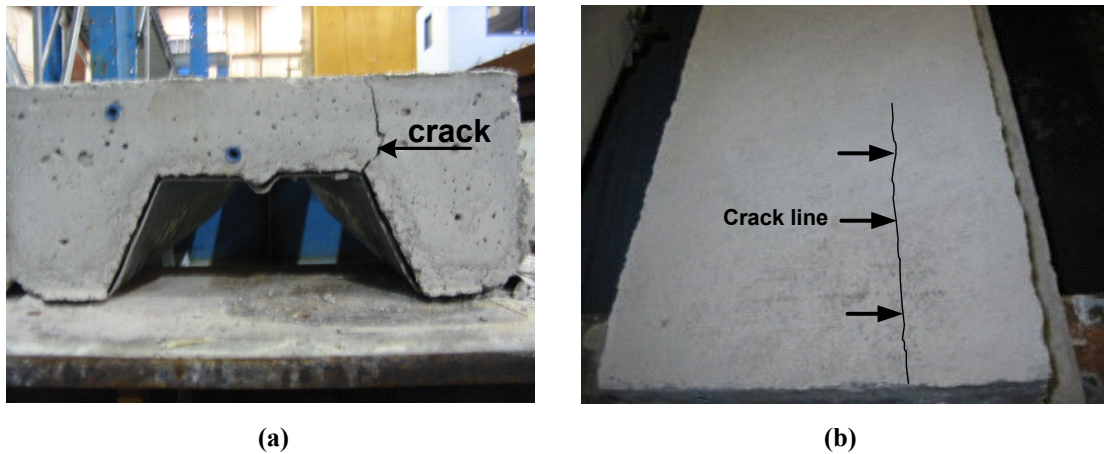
Longitudinal cracking of concrete along shear span for test A of specimen #20: 3VL16-8-5s-A
